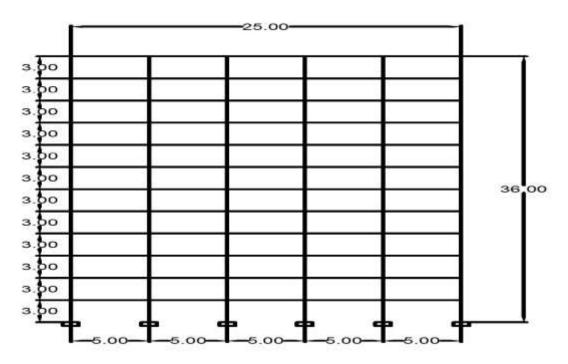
Elevation of 12 storey building without bracing in longitudinal direction
